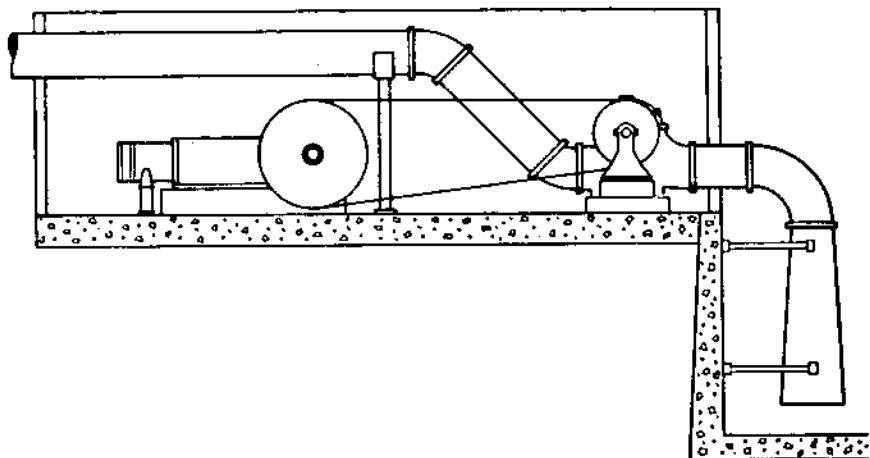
Discharge pipe from centrifugal pump belt-driven by horizontal oil engine in McGee Creek plant is carried over the engine to reduce floor area required.
